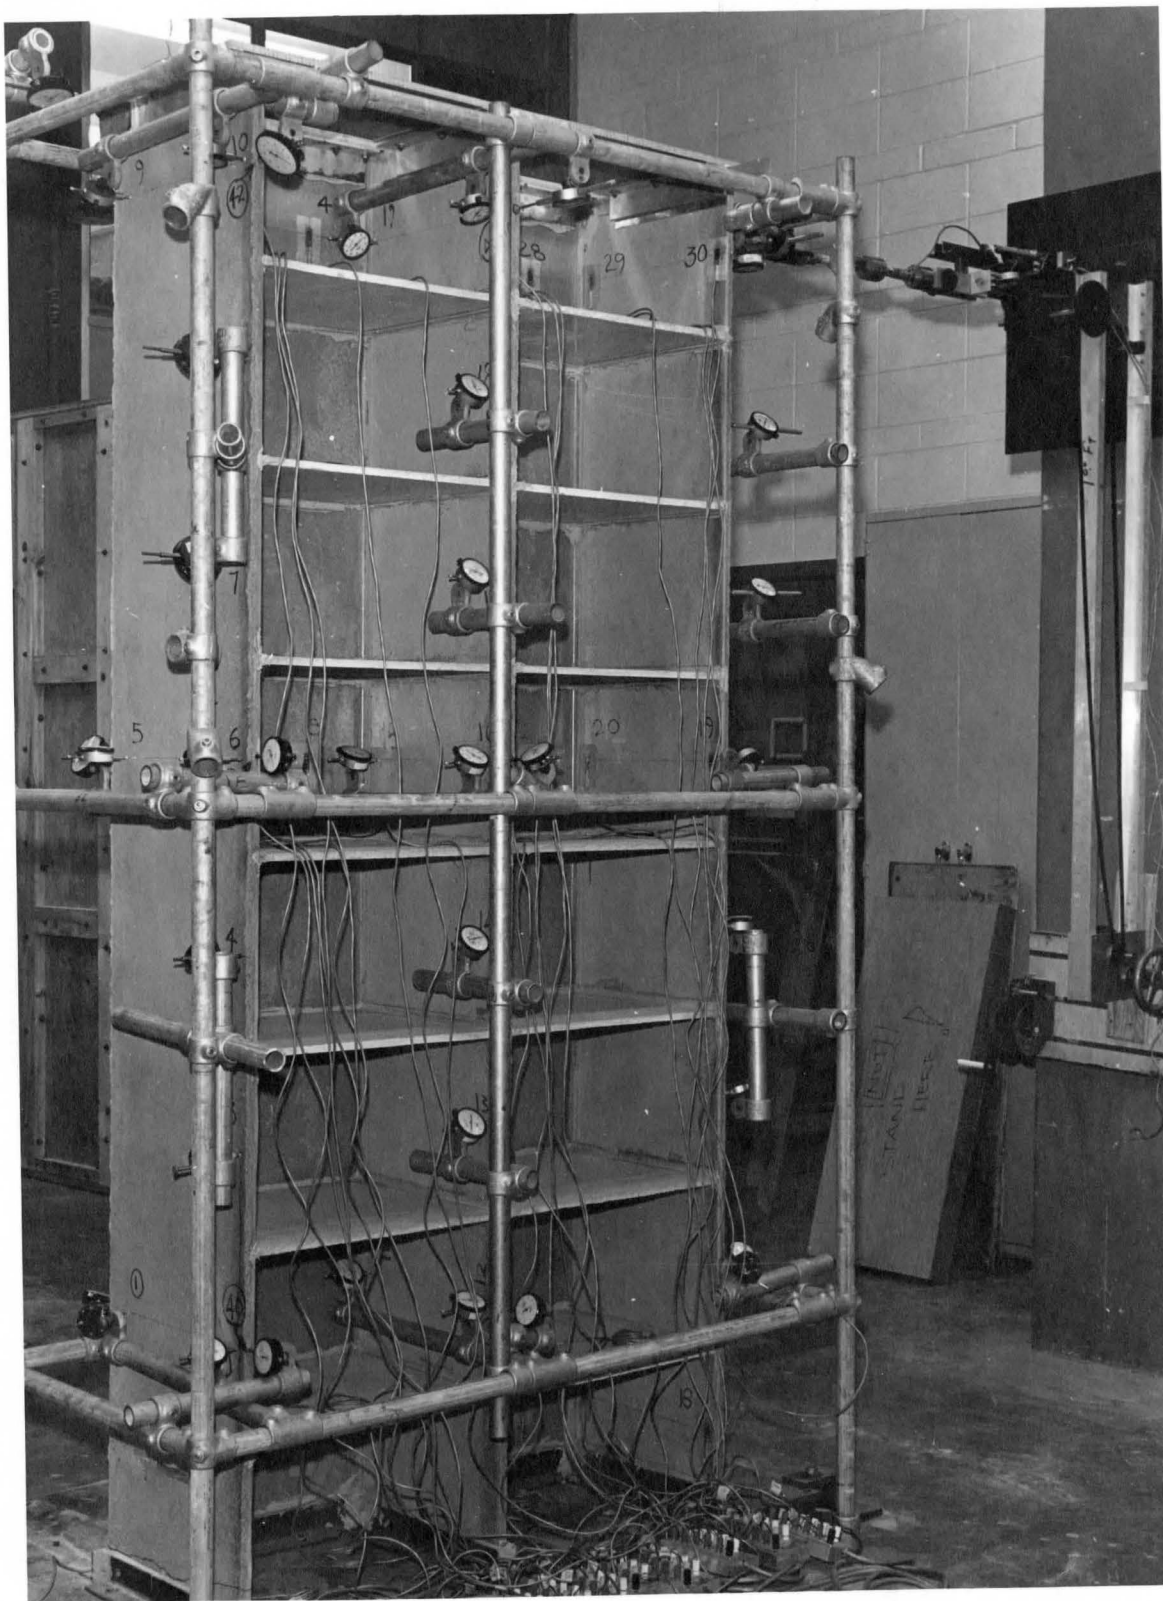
FULLY INSTRUMENTED BUILDING 11 READY FOR TESTING
